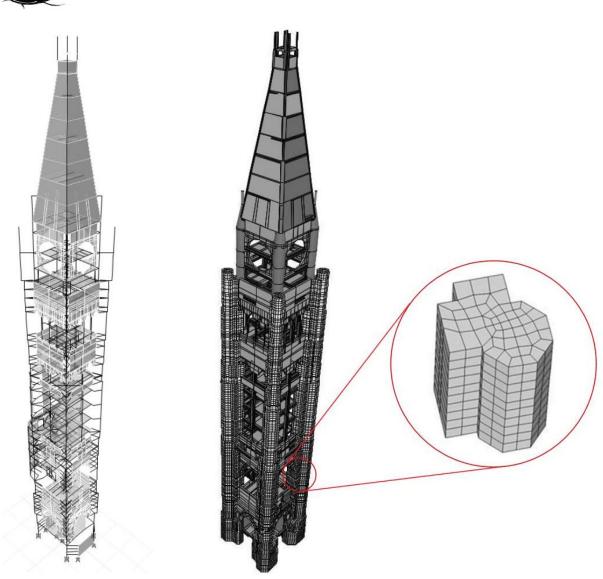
Peace Tower frame element model (left) and solid element model (right)
